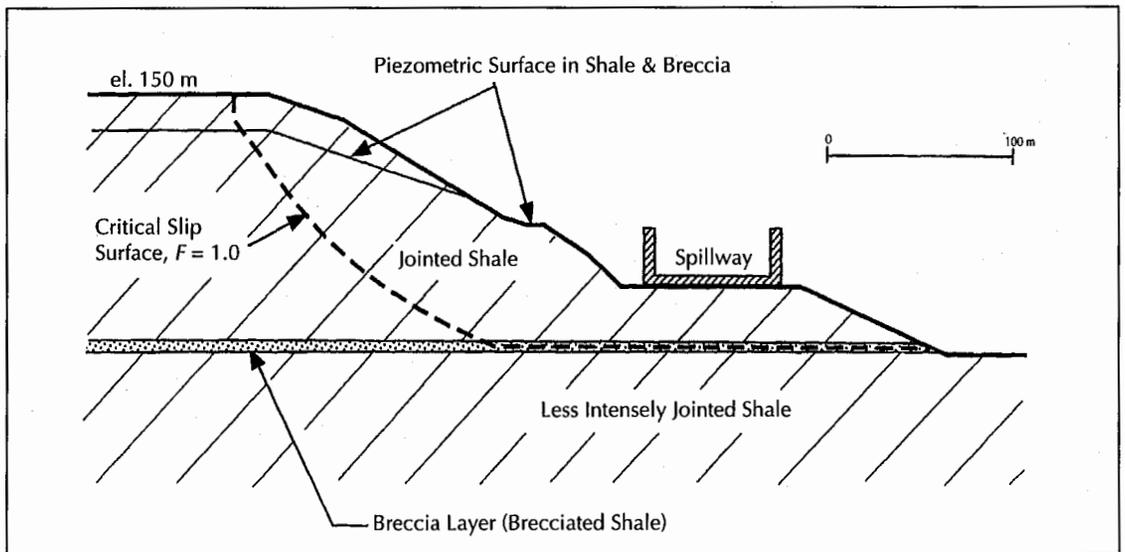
A cross-section through La Esperanza Dam's right abutment and spillway.
